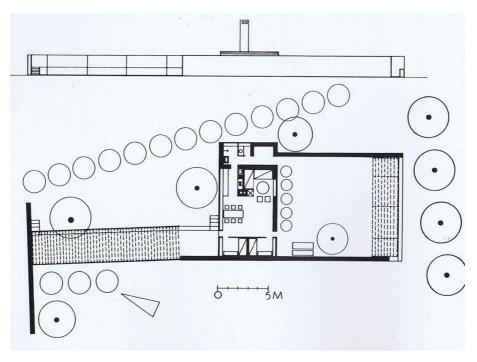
Elevation and a floor plan, in which the existing trees are presented as strongly as the architecture and furnishing.
